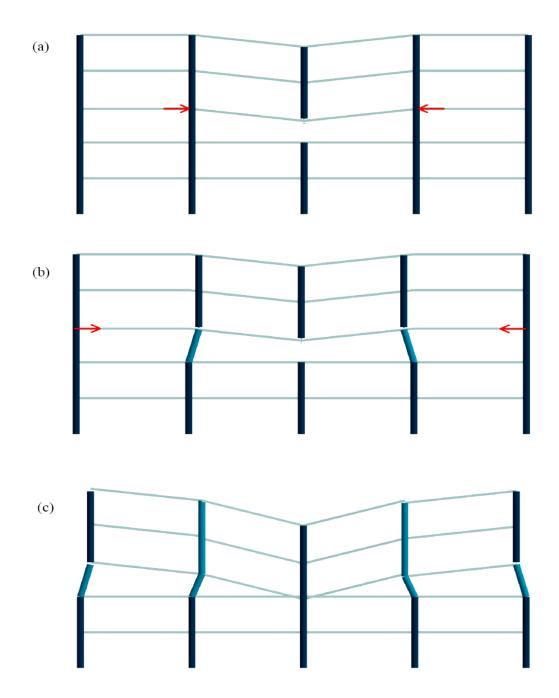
The steps of domino-type progressive collapse: a) initial failure and loading of the column next to it; b) overturning of the columns; c) the progression of the collapse due to the overturning (Johan R., 2010, p. 21)
